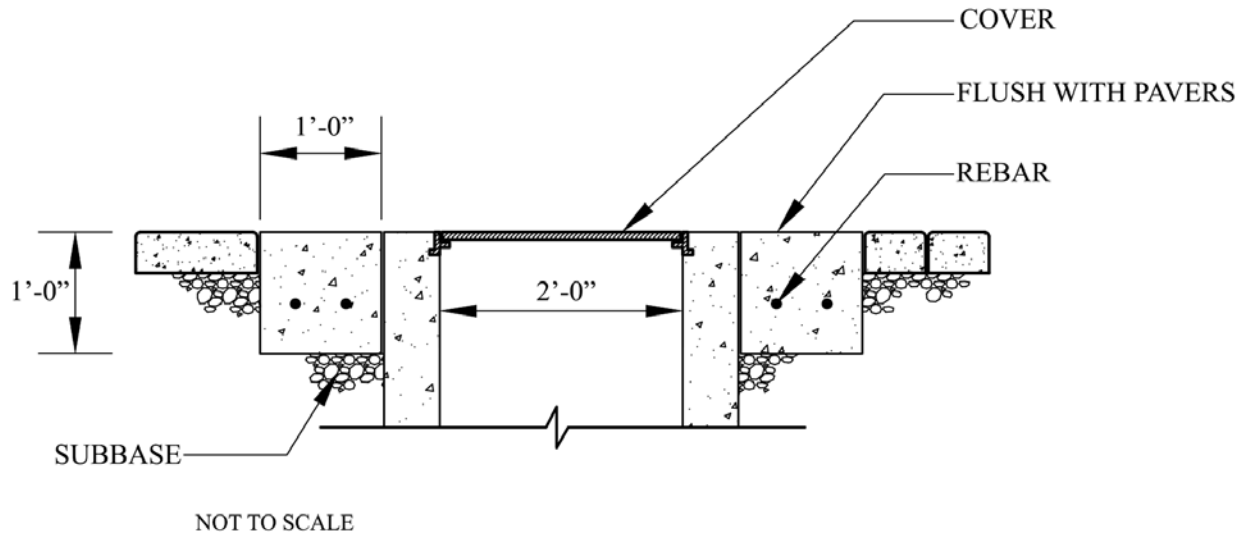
Typical Pervious Pavement-Manhole Interface Detail, *image by Author*.
